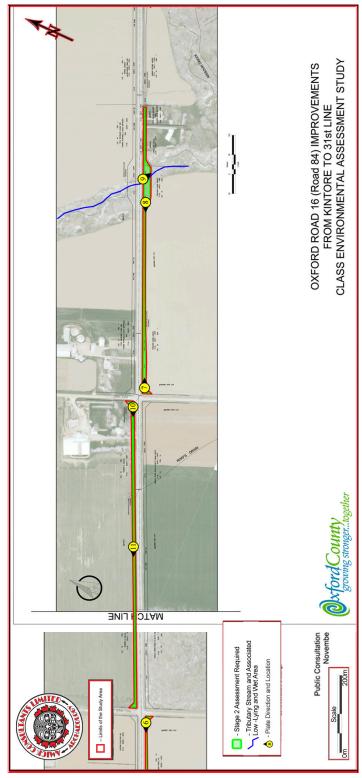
C DETAILED PLAN OF COUNTY ROAD 16
